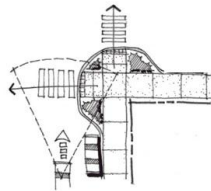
Curb extensions increased sidewalk space and provide additional corner storage space .
